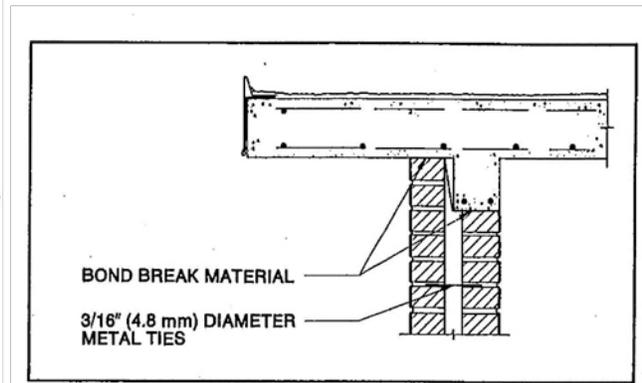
Concrete Masonry Details: Technical Notes on Brick Construction
